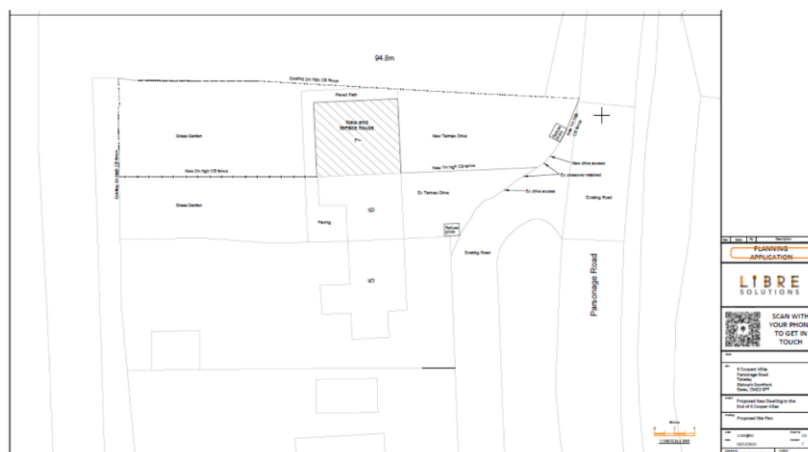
Proposed Location and Footprint – Libre Solutions Proposed Site Plan
